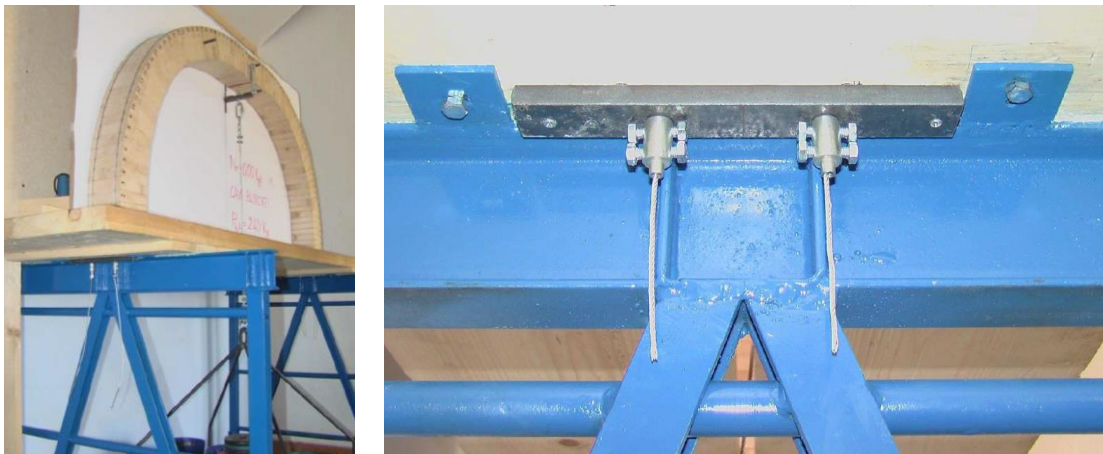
Details of overall tests setup (left) and anchors detail (right). (Giglio, 2008).
